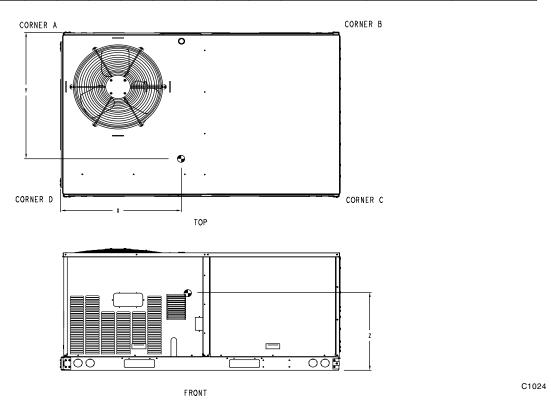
Unit Dimensional Drawing -RHH036 - 060 (cont.)
